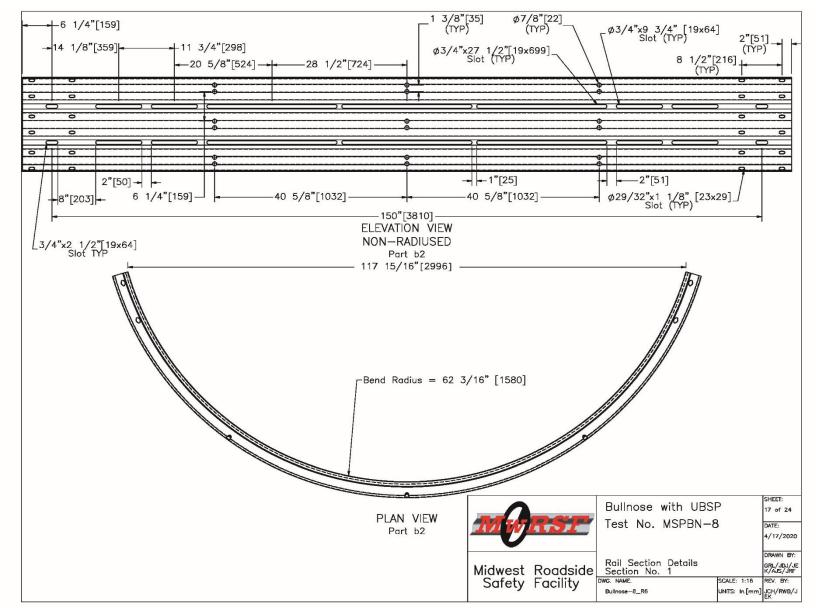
Rail Section Details, Section No. 1, Test No. MSPBN-8
